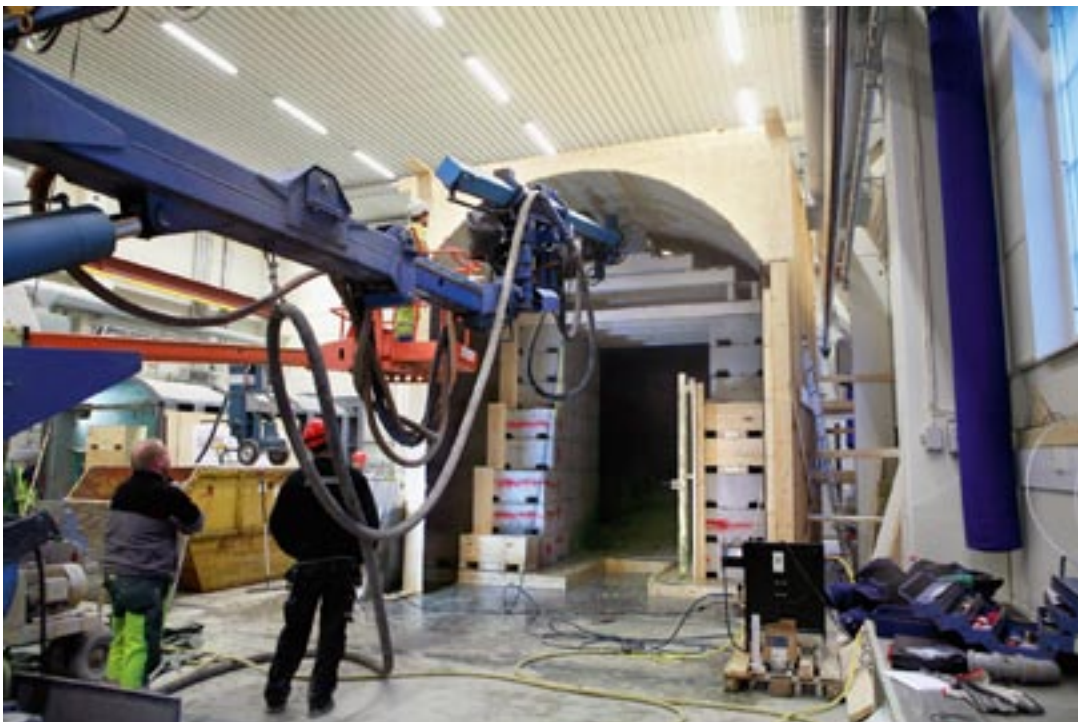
The wooden test tunnel with stepwise stacked concrete blocks resting on the foundation bed and equipment for pellet blowing.
